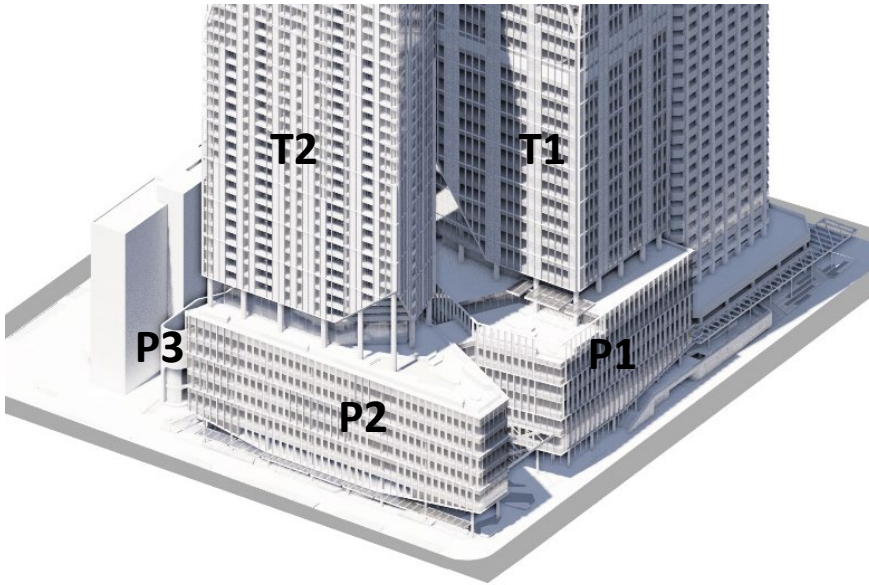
Aerial view showing the form of the podium and its relation to the street and adjoining buildings
